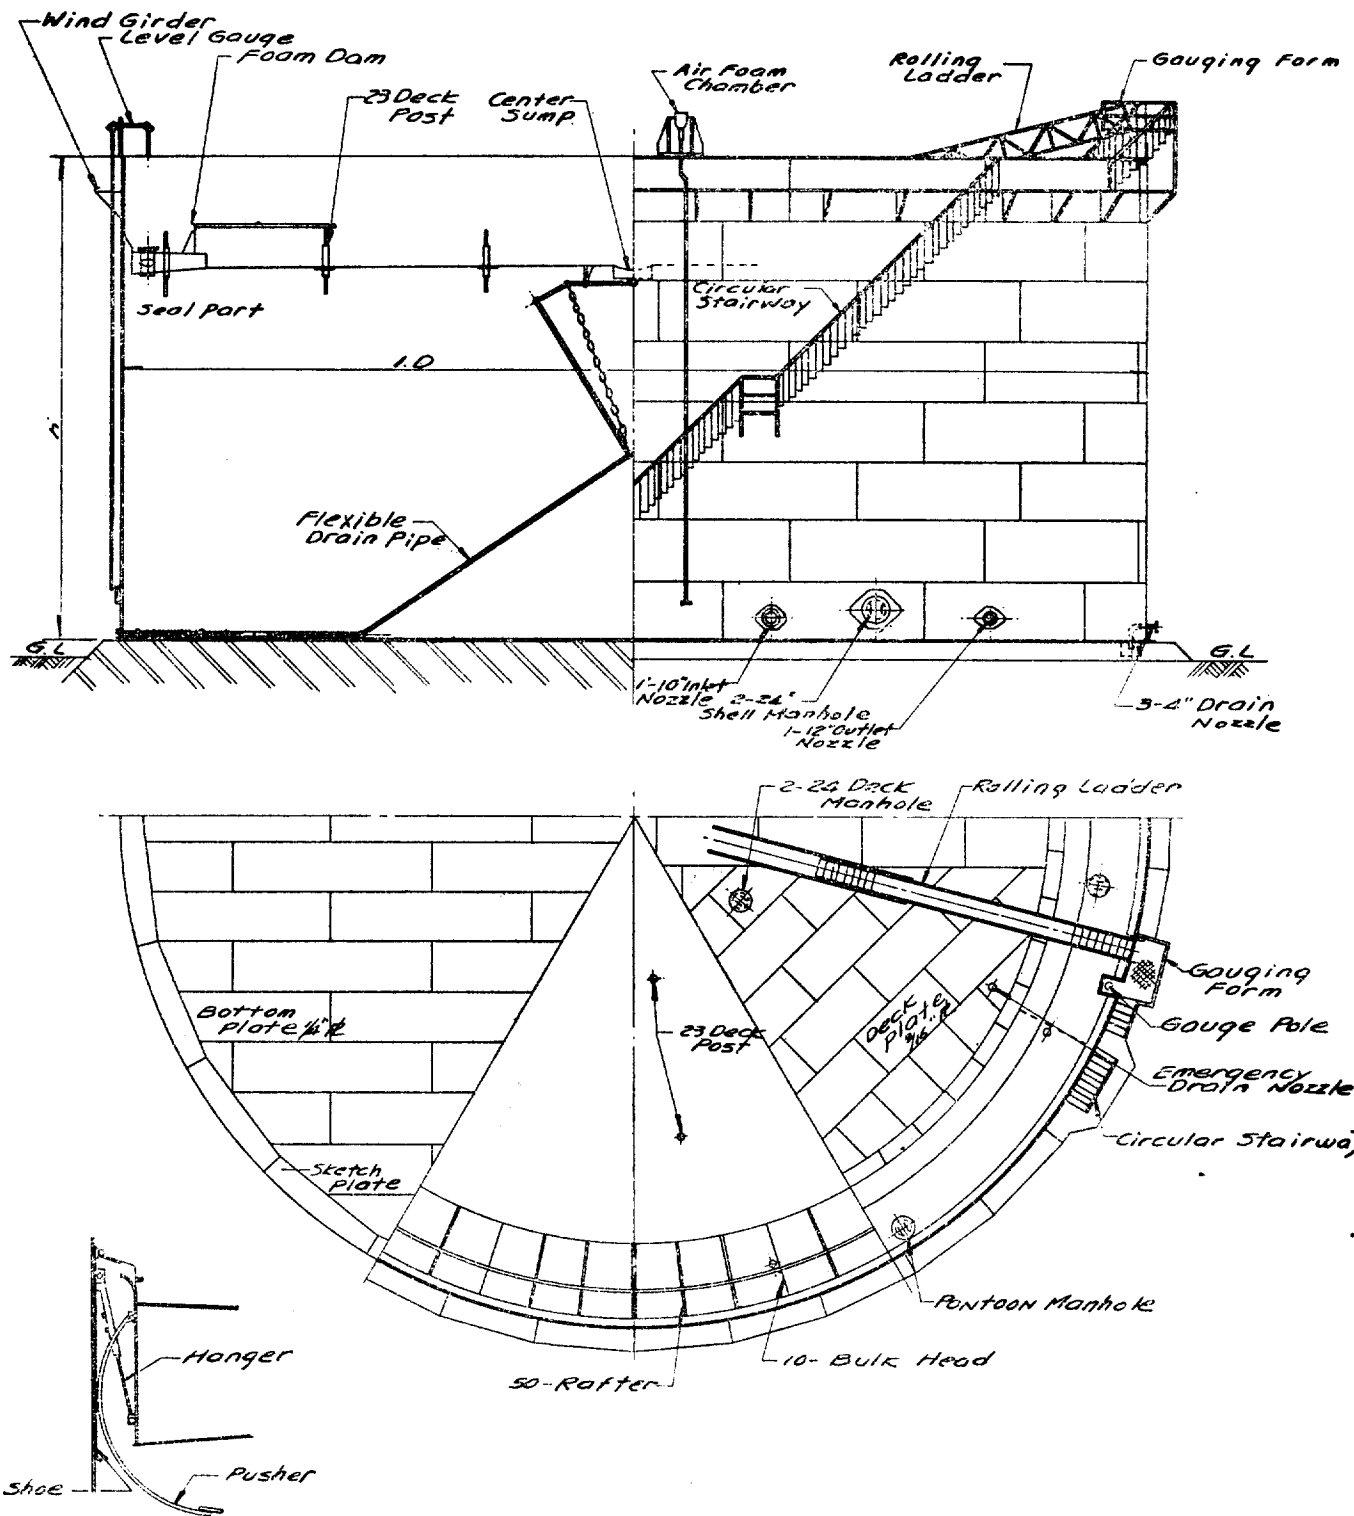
GENERAL PLAN OF FLOATING ROOF TANK
